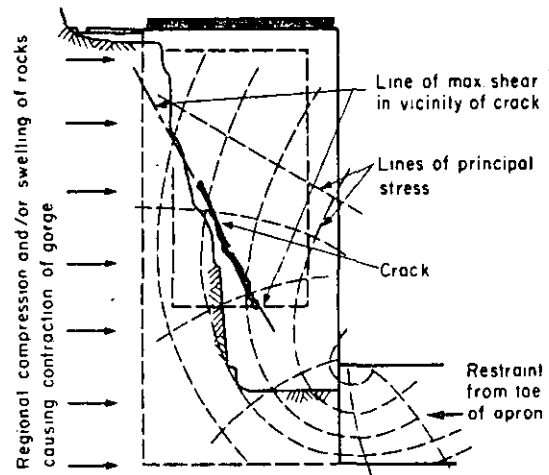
Stresses in valley wall—Crack in wall of building follows line of maximum shear
